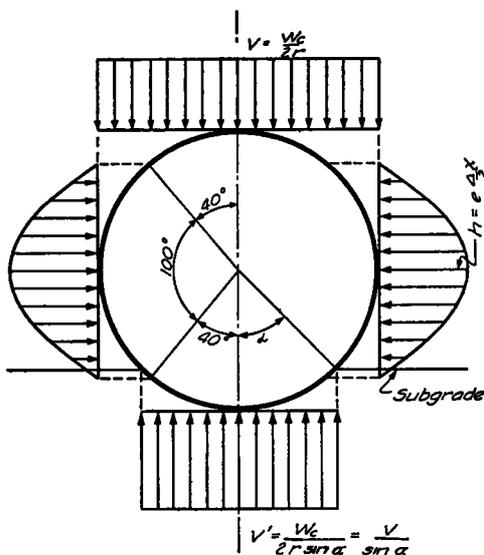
Assumed Distribution of Pressure on Flexible Culvert Pipes
